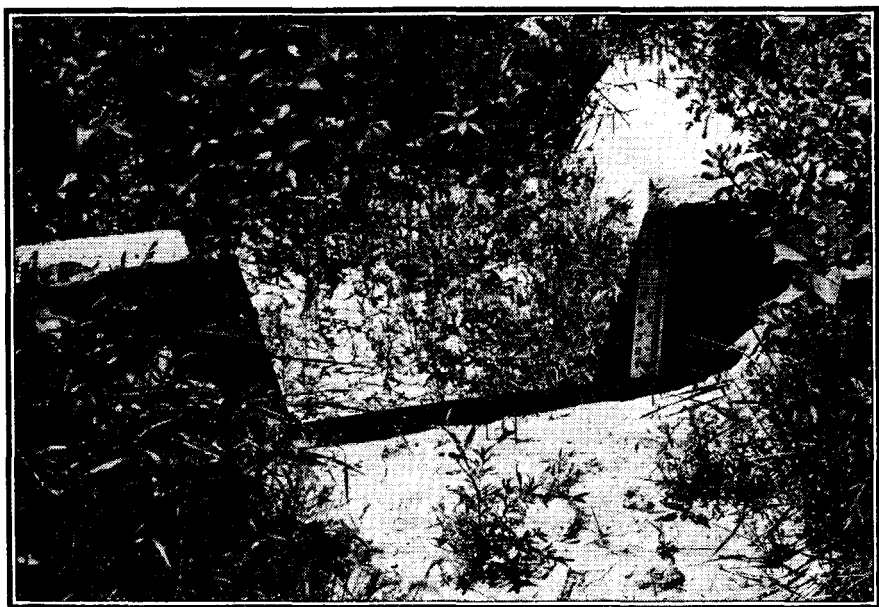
ENAMELED GAGE FASTENED TOO CLOSE TO WEIR NOTCH
